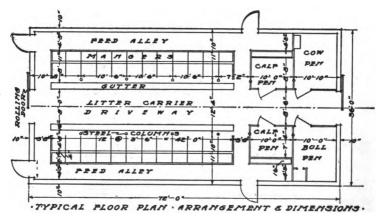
A floor plan of a dairy barn giving usual dimensions.
